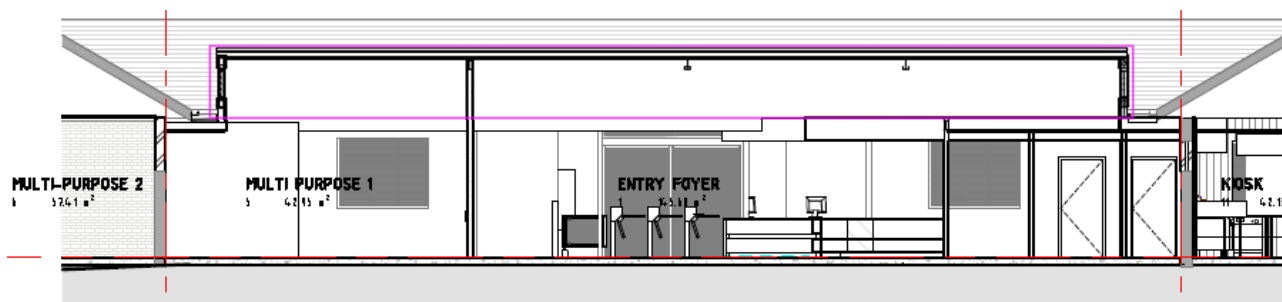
Ground Floor Plan sectional elevation showing addition with new separate roof form over extended Entry Foyer / Reception Area (Pink Outline). The original hipped tiles roof is retained in its existing form.
